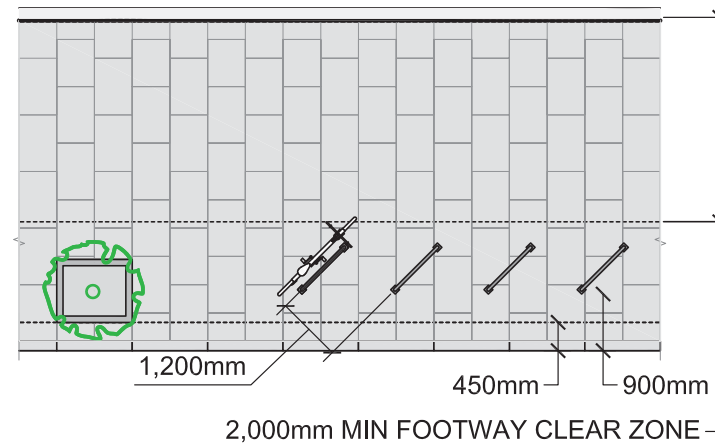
On-footway cycle parking arrangements are dictated by the amount of footway space
